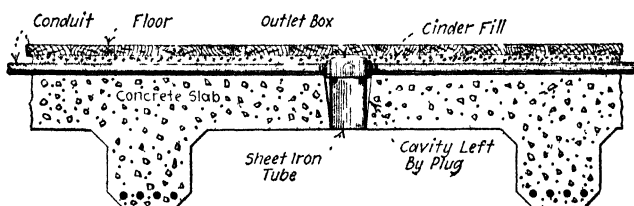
Another method of placing conduit and outlet box in the hole provided in Fig. 299. This method avoids sharp bends in the conduit.
